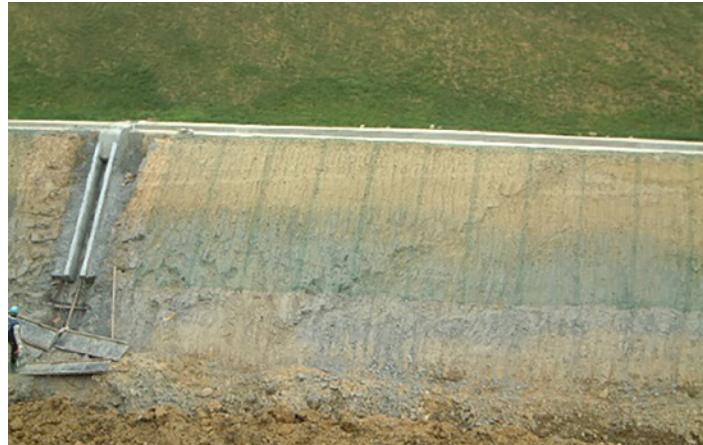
Pre-failure slope at Case 1 showing the joint plane intersecting the slope surface
